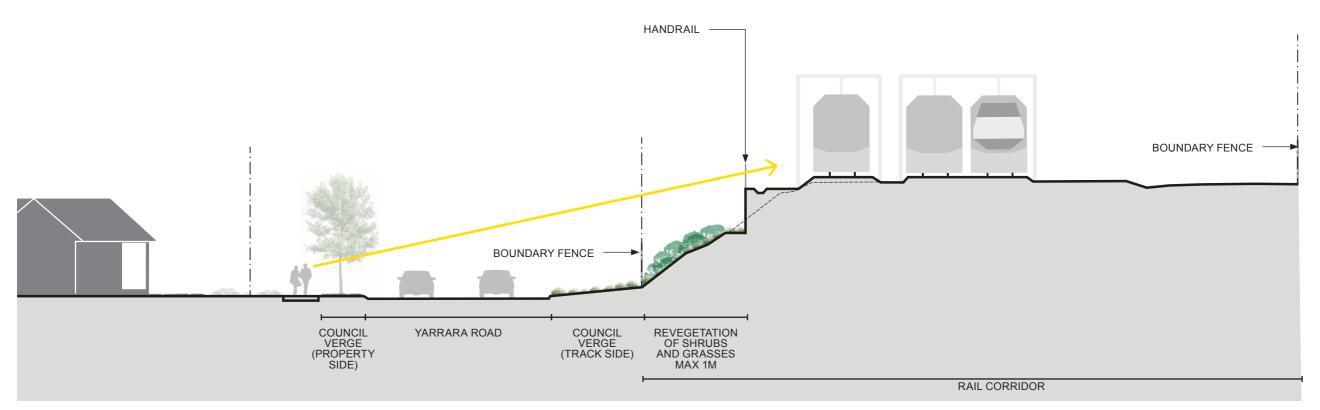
Typical cross section tracks above street level at Yarrara Road
